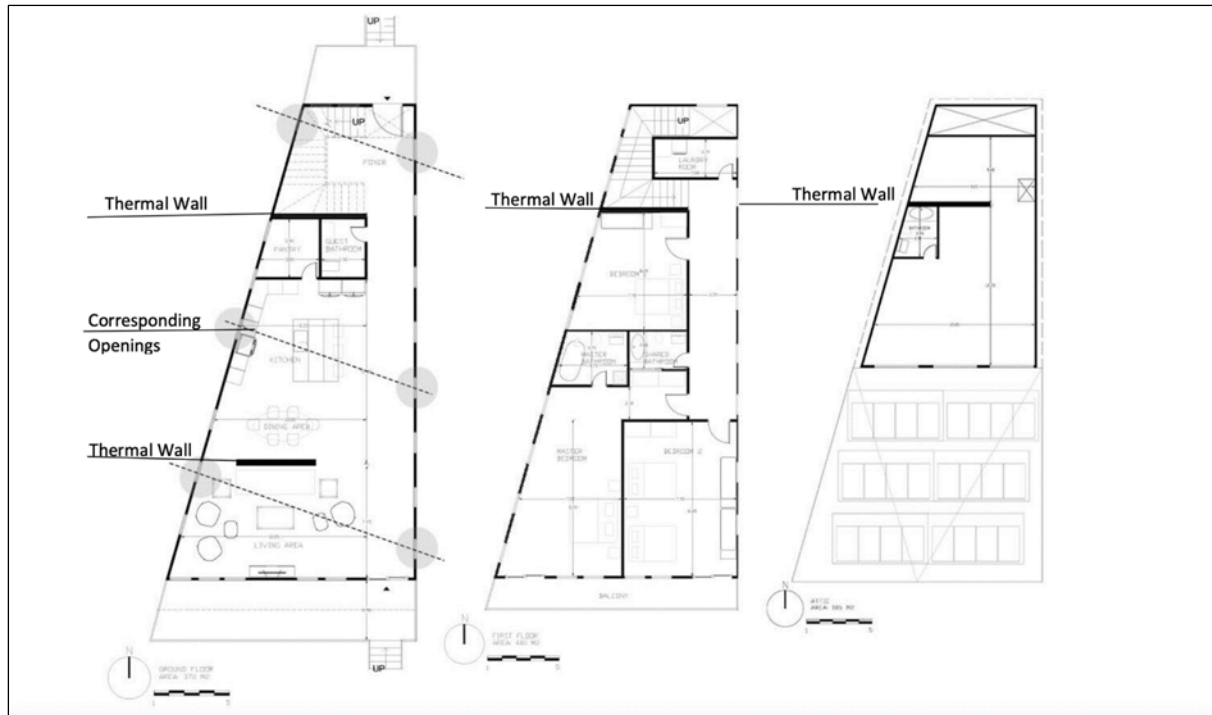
Plan Detail of all three floors for sunlight utilization.
